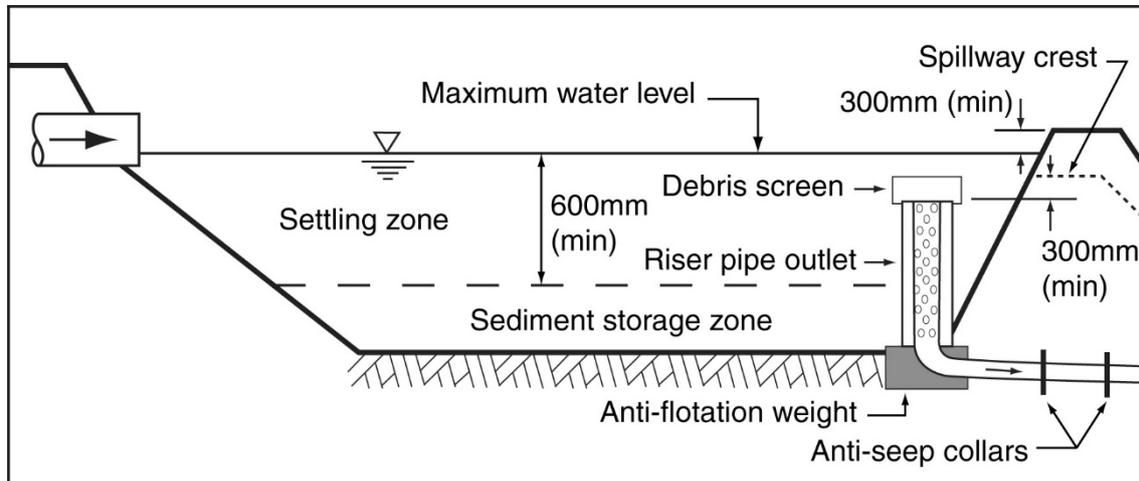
Type C sediment basin with riser pipe outlet (long-section)
